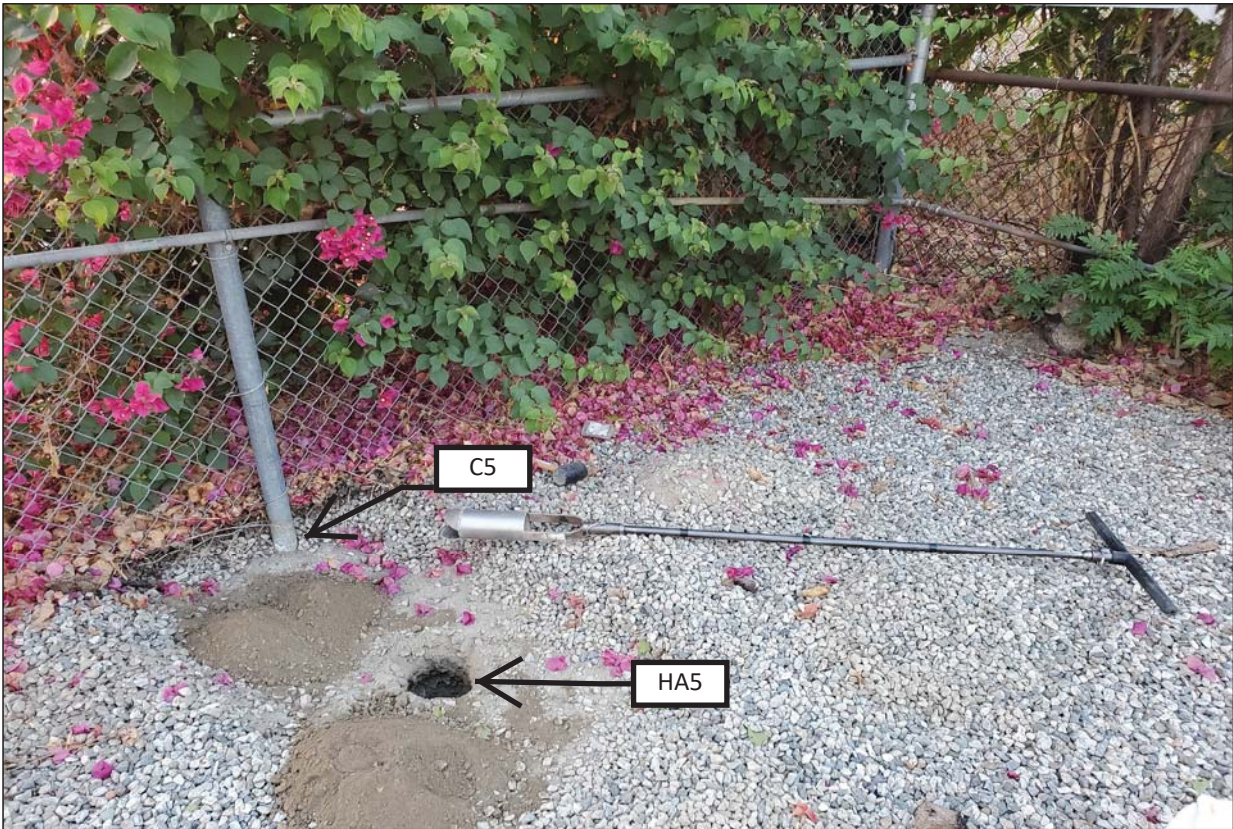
HAND AUGER LOCATION HA5 AND CONCRETE SAMPLE LOCATION C5
